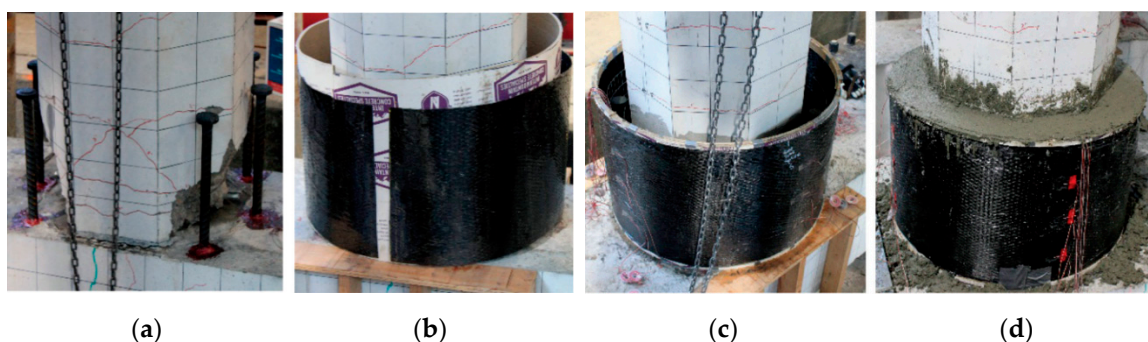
Repair procedure with CFRP shell and concrete: (a) Post-installed headed bars; (b) Split CFRP shell; (c) CFRP shell around column; (d) CFRP shell filled with non-shrink or expansive concrete [84-Authorized Reprint from American Concrete Institute].
